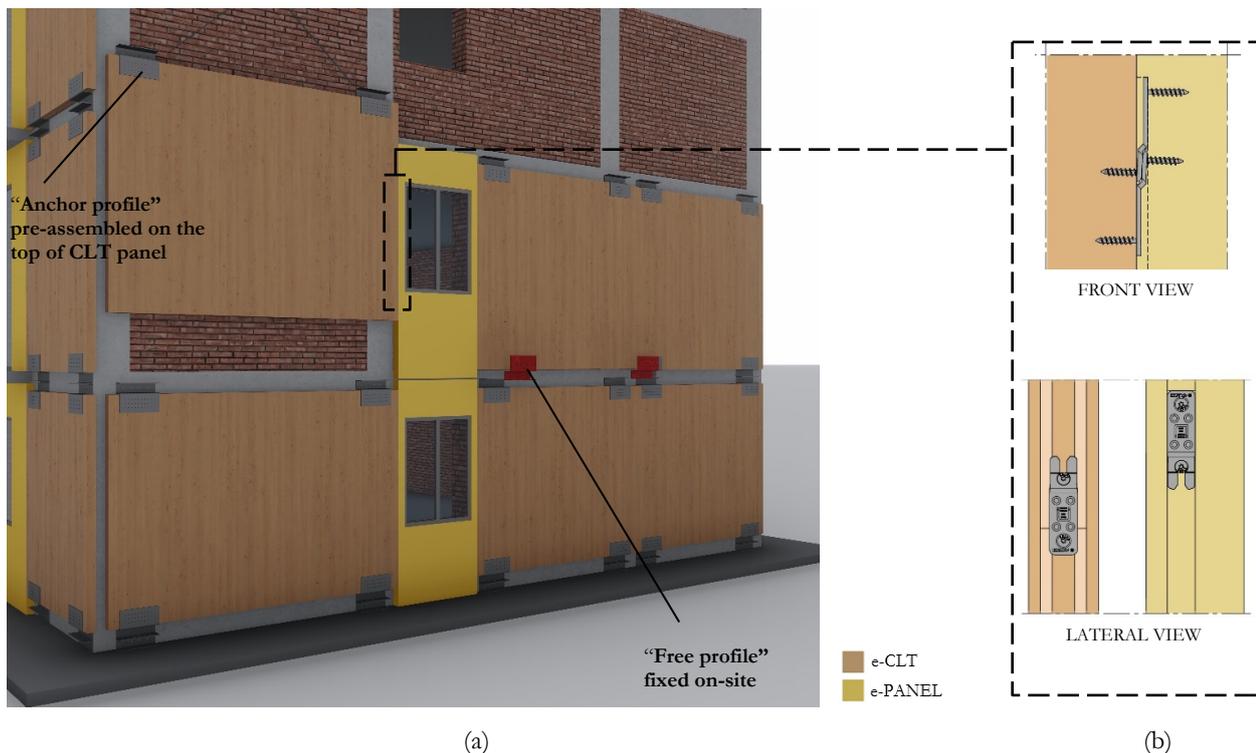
(a) Installation of the proposed retrofit technology; (b) example of concealed wood connector between e-CLT and e-PANEL [15]. (e-CLT and e-PANEL are reported without insulation and cladding layers)
